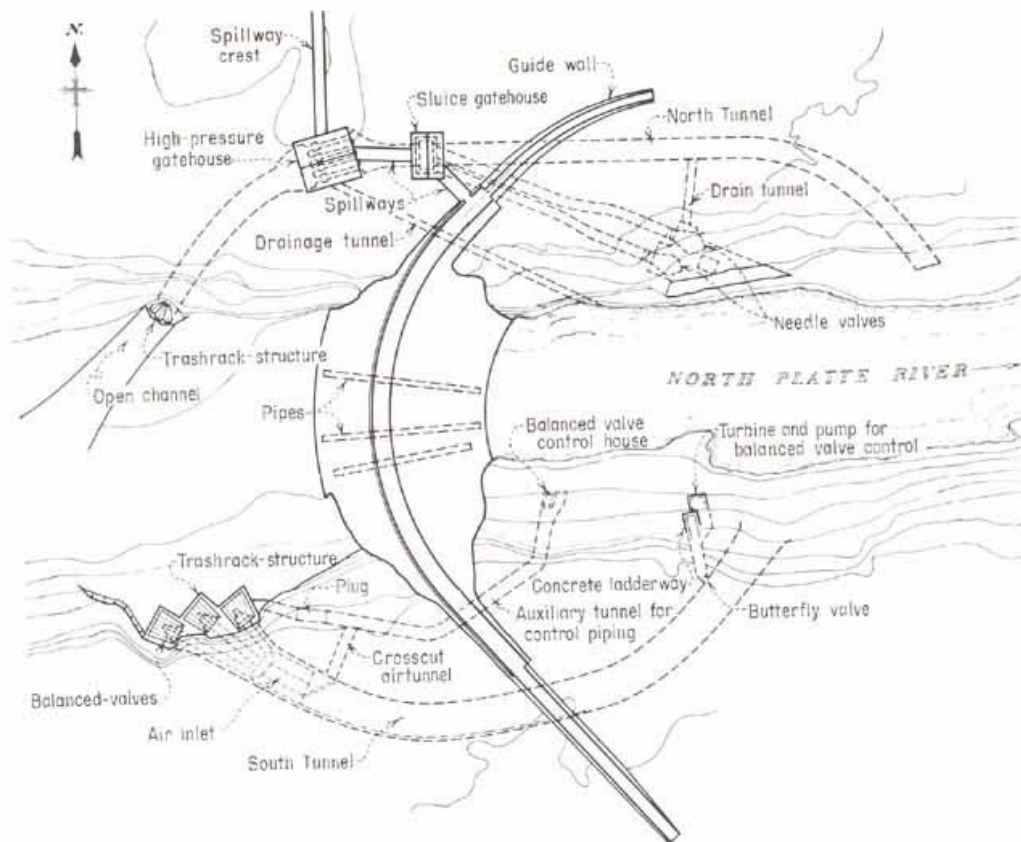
Pathfinder Dam, plan. P-801-D-79320.
